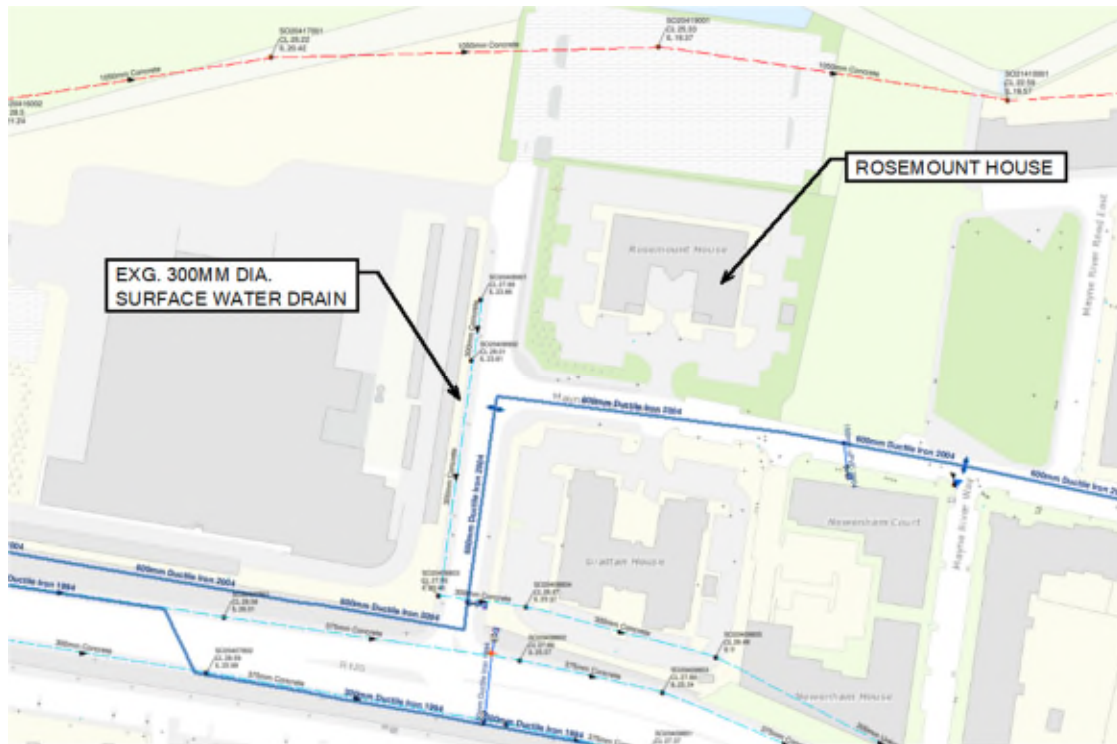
Irish Water Network Plan – Existing Surface Water Drainage Infrastructure
